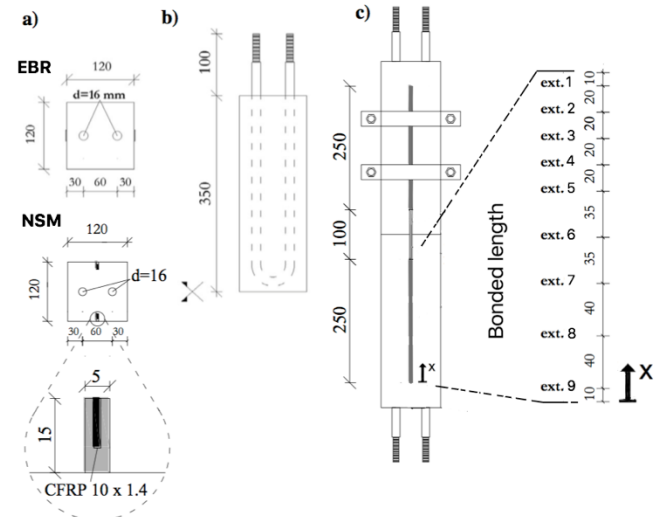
Test specimens geometry (a, b) and detail of instrumentation (c) [11, 13].
